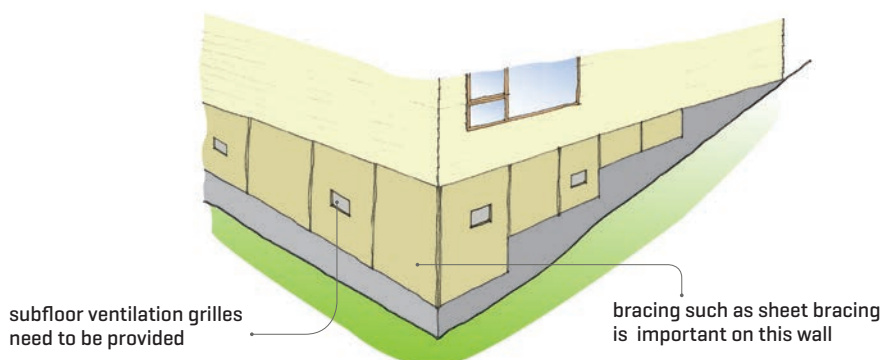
Sheet bracing to wall framing/jack studs under a floor.
